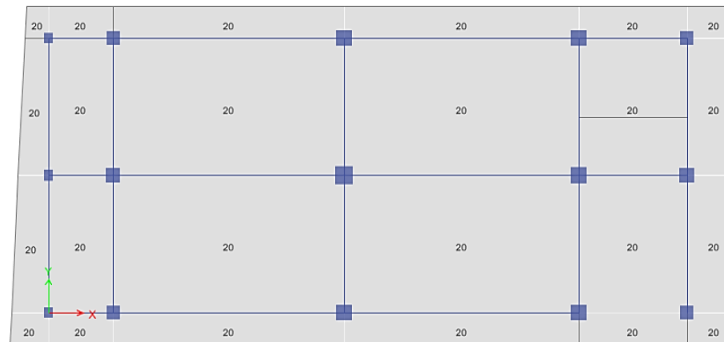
Applied Floor Finish in Typical Floor (20psf)
